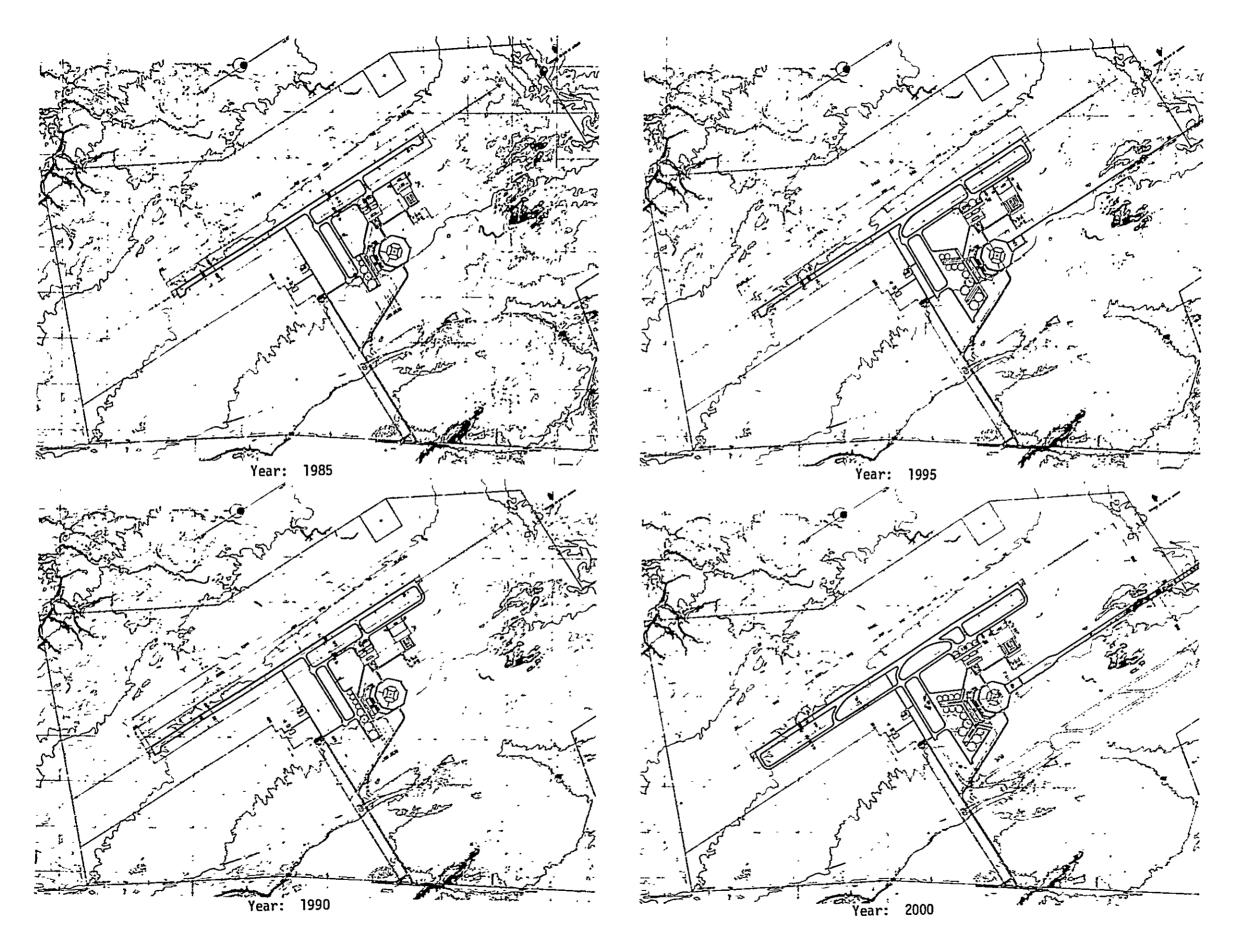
Facility Layout of New Santa Cruz -Viru Viru International Airport
